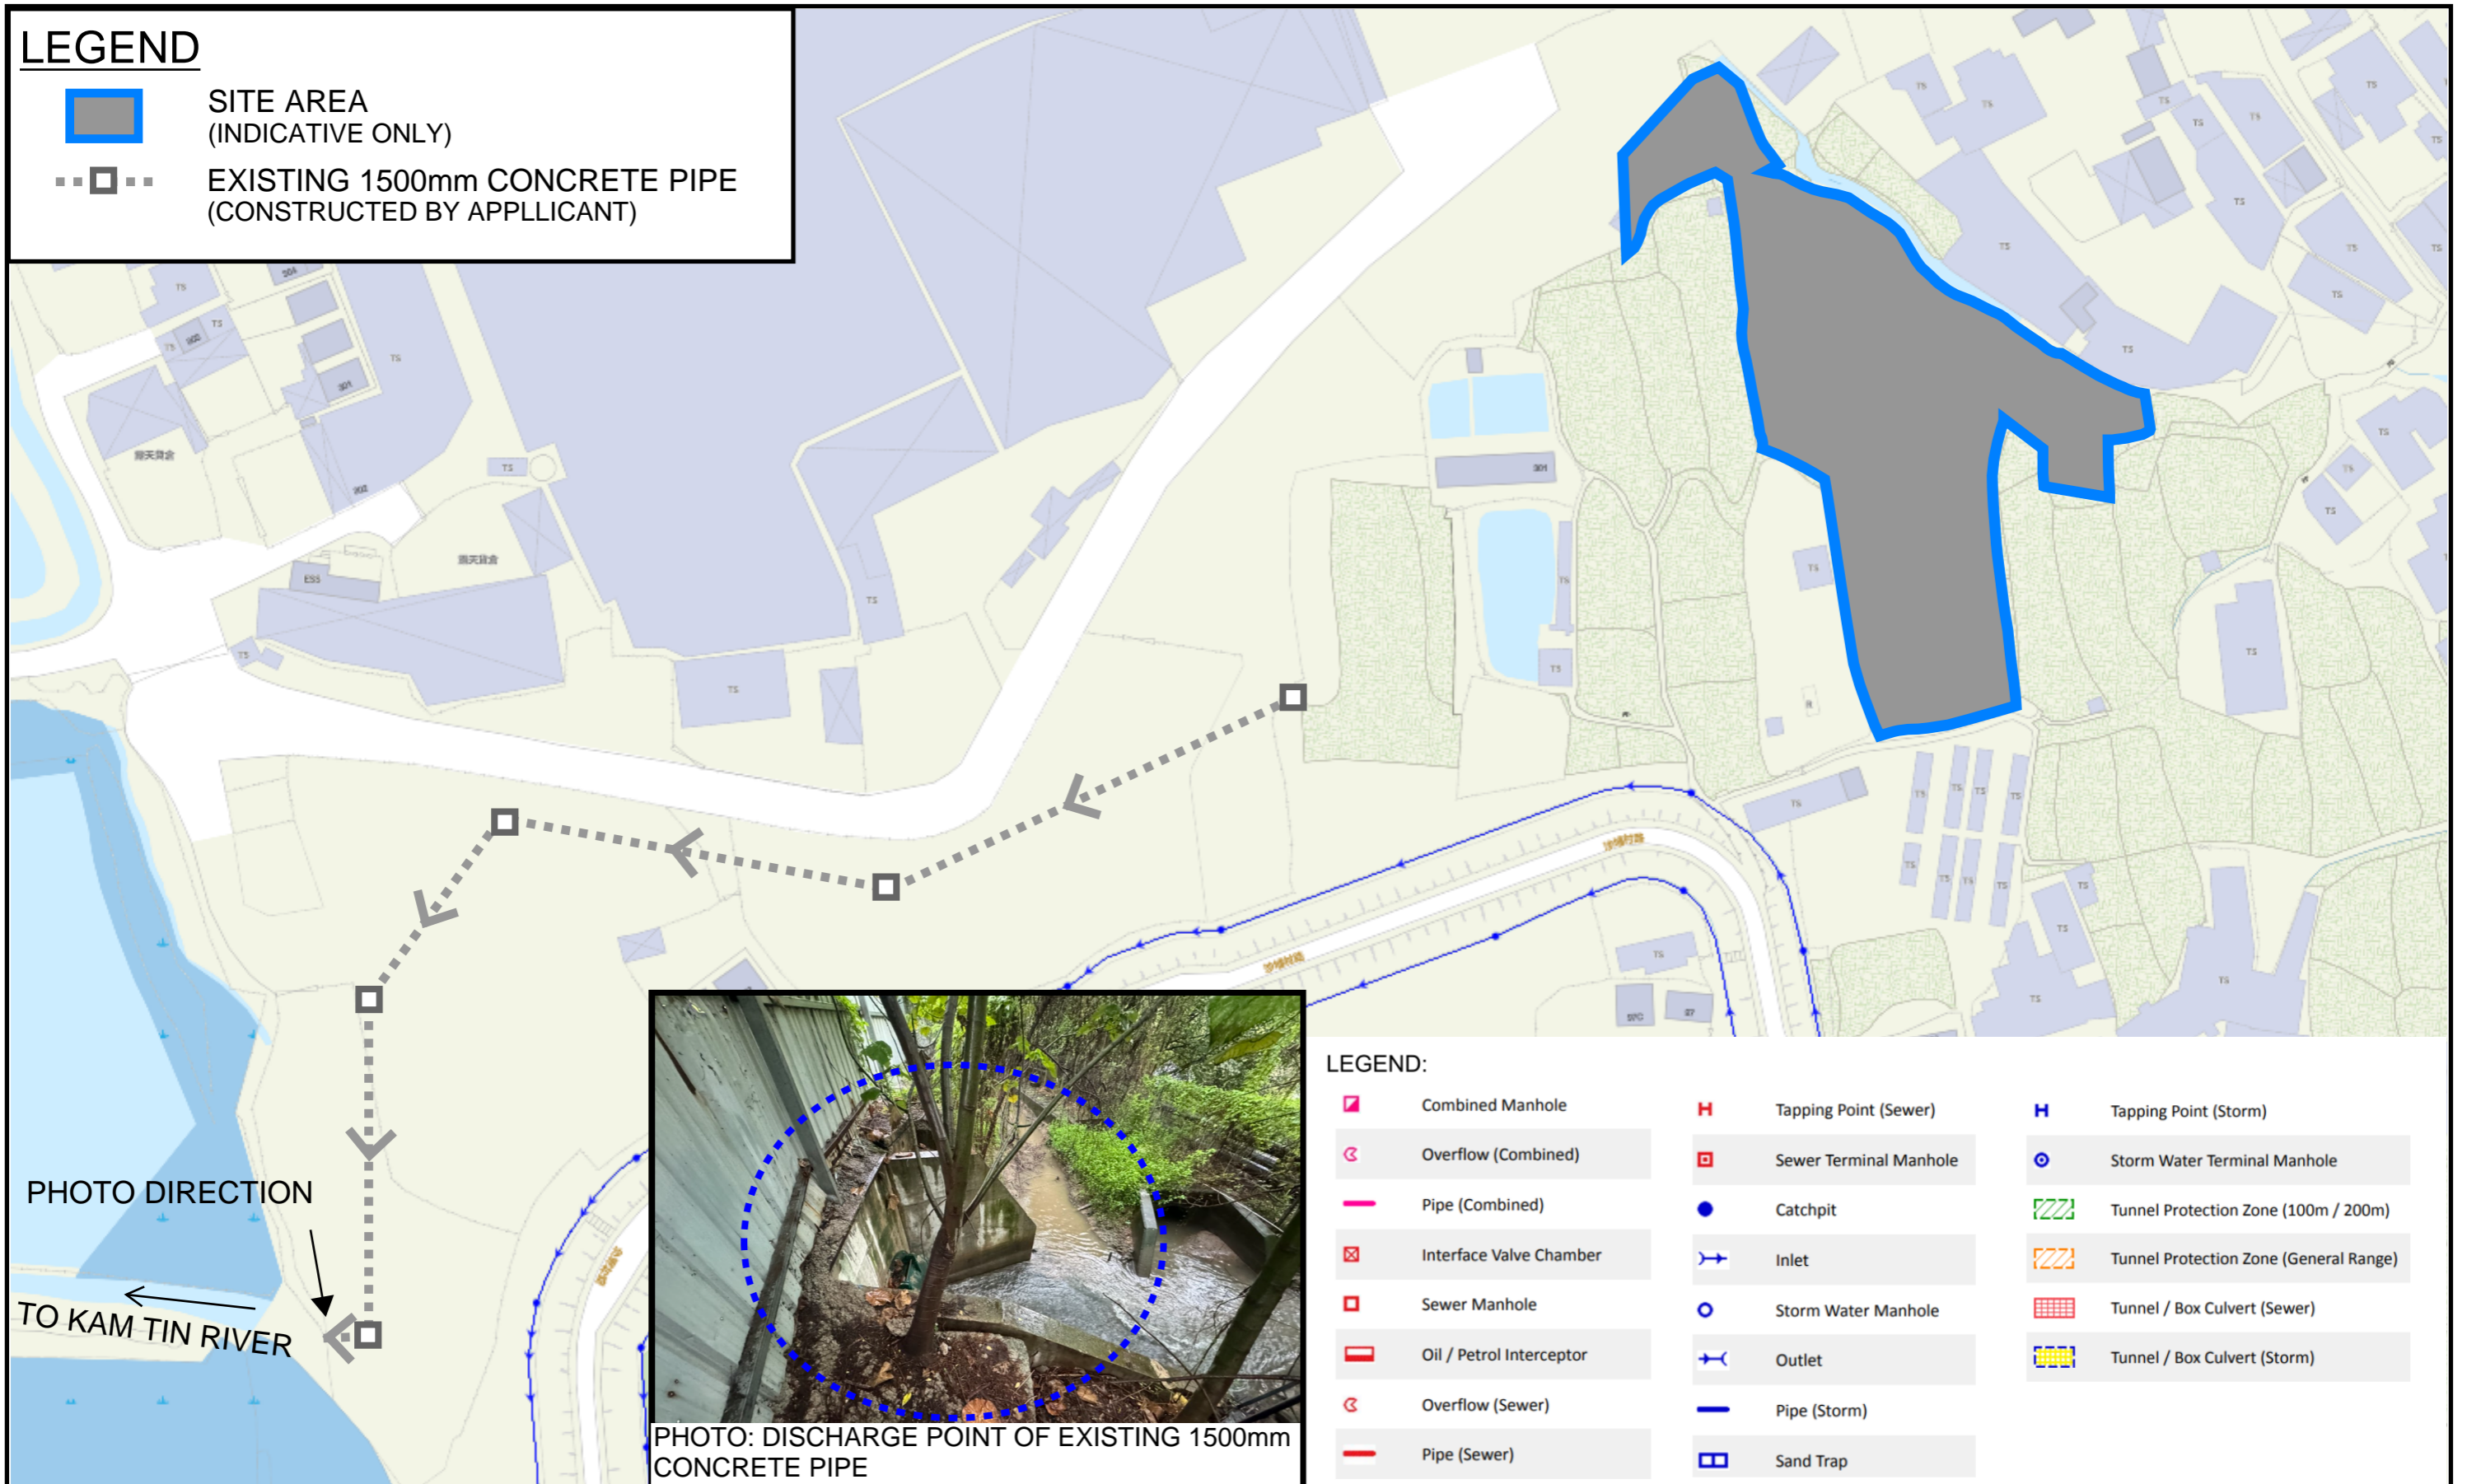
PHOTO: DISCHARGE POINT OF EXISTING 1500mm CONCRETE PIPE
